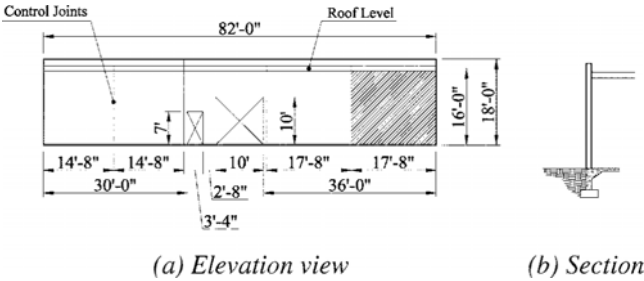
Schematic of the masonry wall (1 in. = 25.4 mm).
